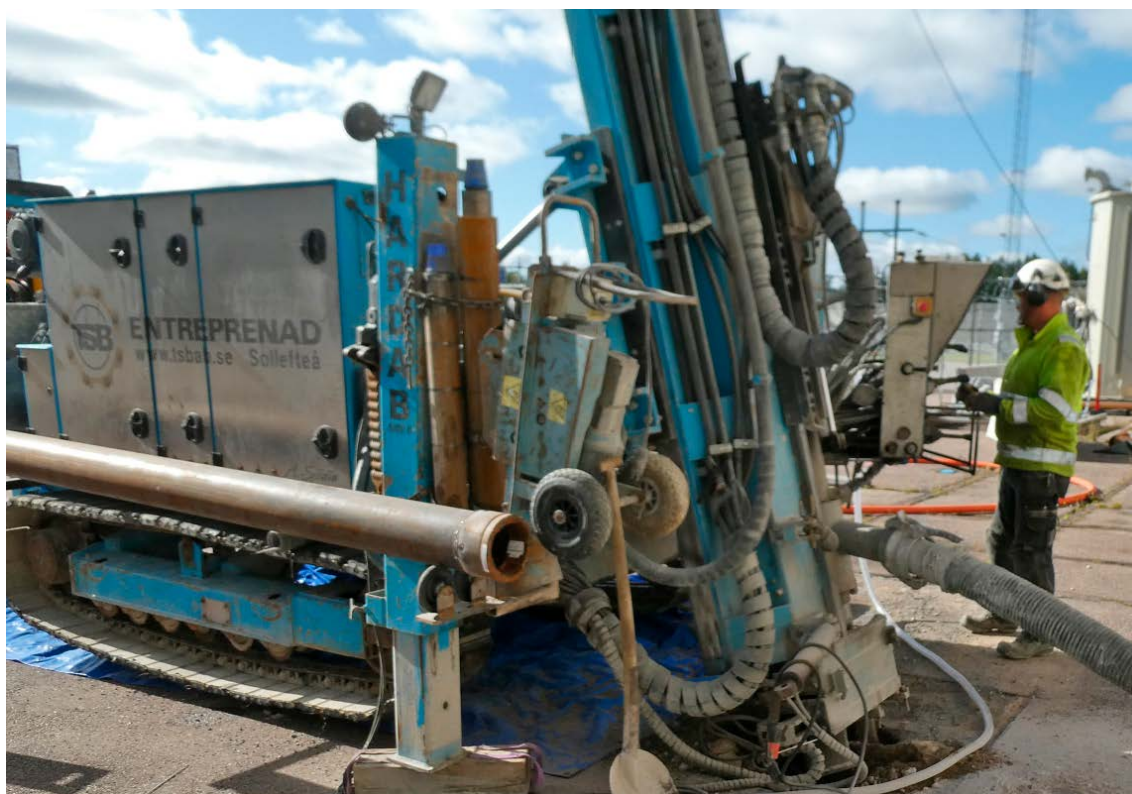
The HARDAR 5000H drilling machine at drill site KFM27. To the left a casing with a drill ring welded at the casing end. In KFM27 a c. 9 m casing was drilled through the overburden and some metre into the bedrock.
